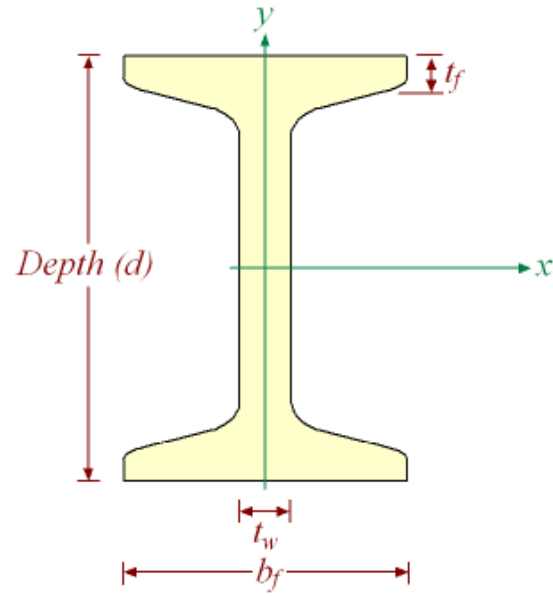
Typical steel section with dimensions (AISC 2013)
